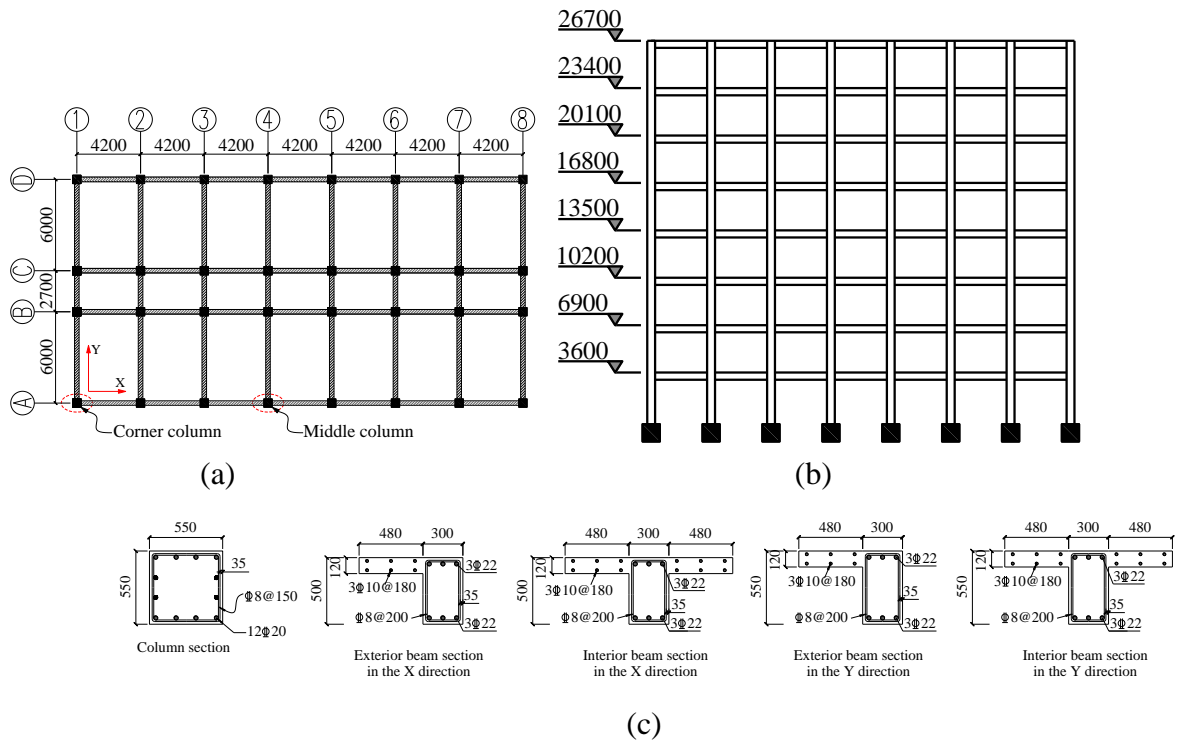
Dimension and reinforcement details of Specimen S1 (unit: mm)
